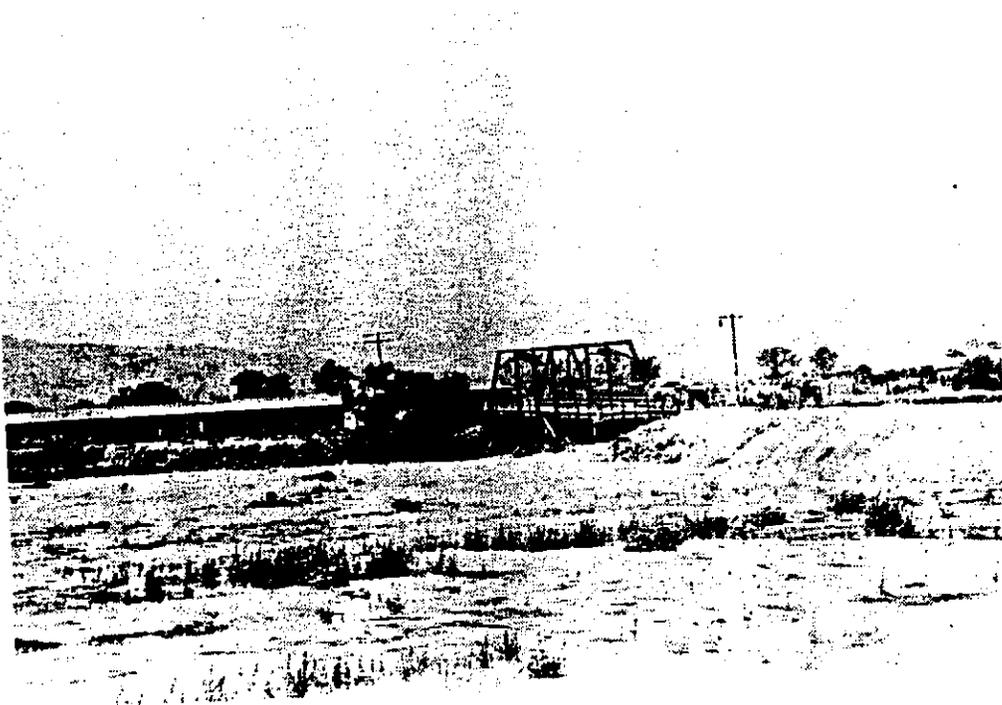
A similar view as Figure 54 in July 1915. A berm was built to join the east approach to the bridge (Special Collections, University of Arizona Library, Tucson).
